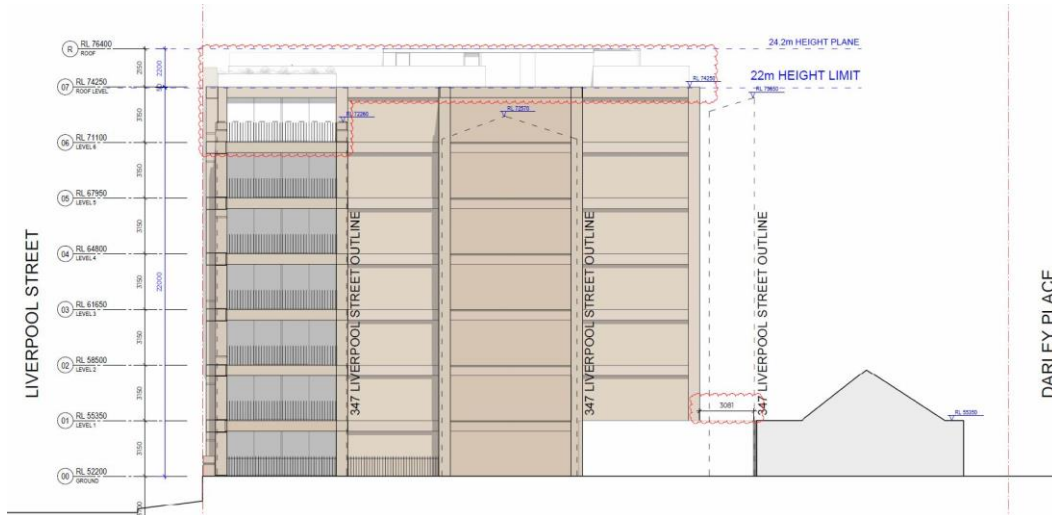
West elevation drawing extract depicting the 3 metre building separation to the dwelling house at 1 Darley Place
